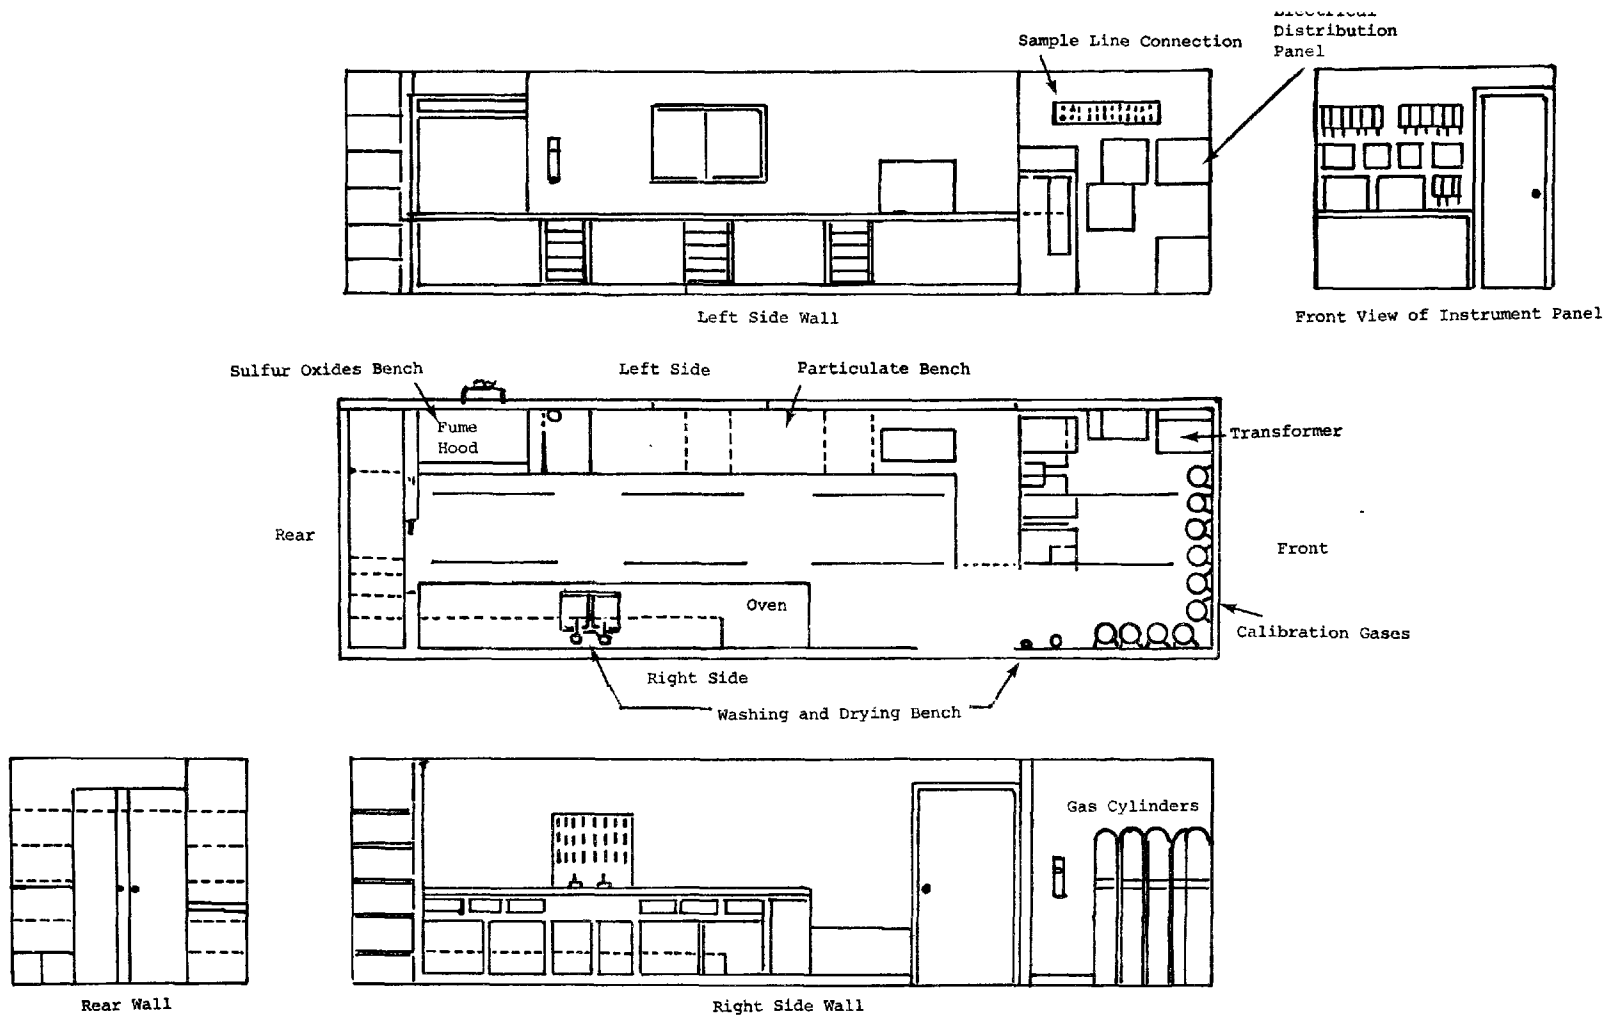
Instrumentation trailer floor plan and side wall elevation.
